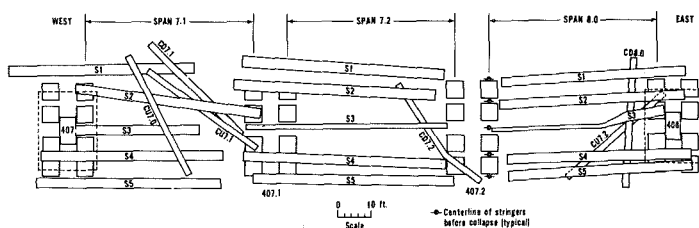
Location of Stringers and Crossbeams After Collapse
